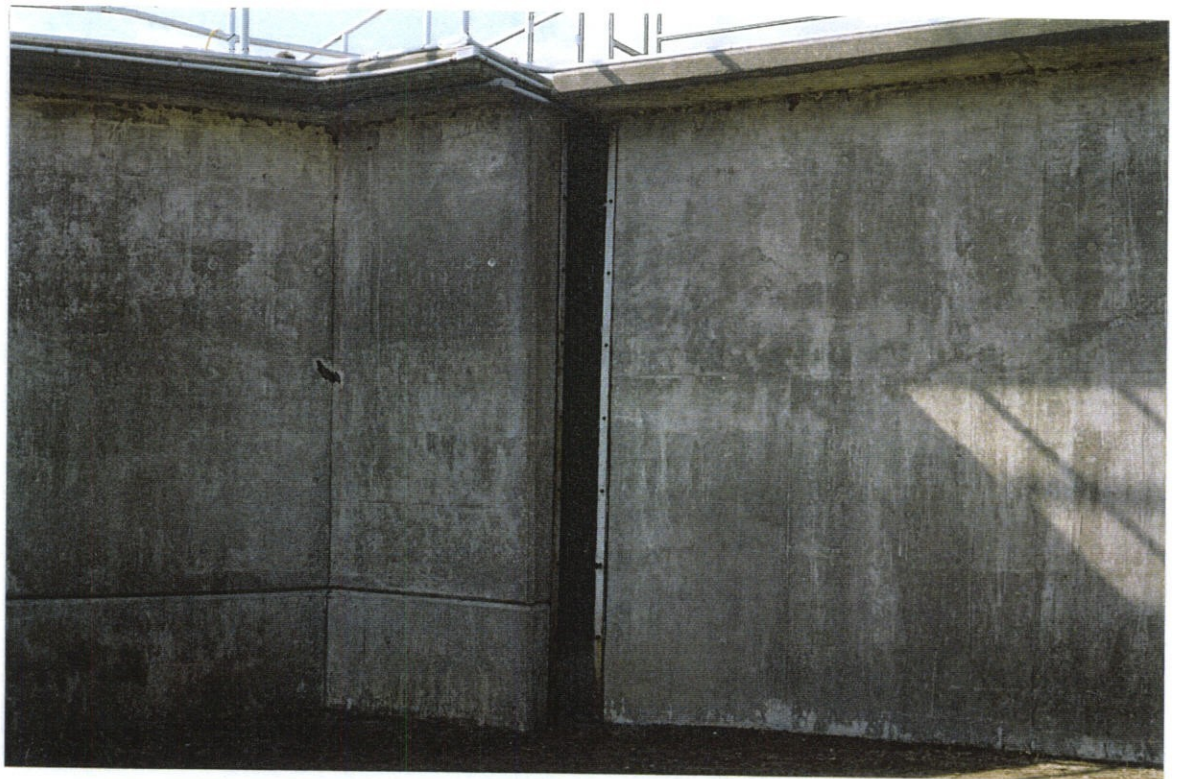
NEOPRENE SHEET OVER FLOODSIDE OF JOINT BETWEEN WEST "T" WALL MONOLITH AND GATE BAY MONOLITH.
